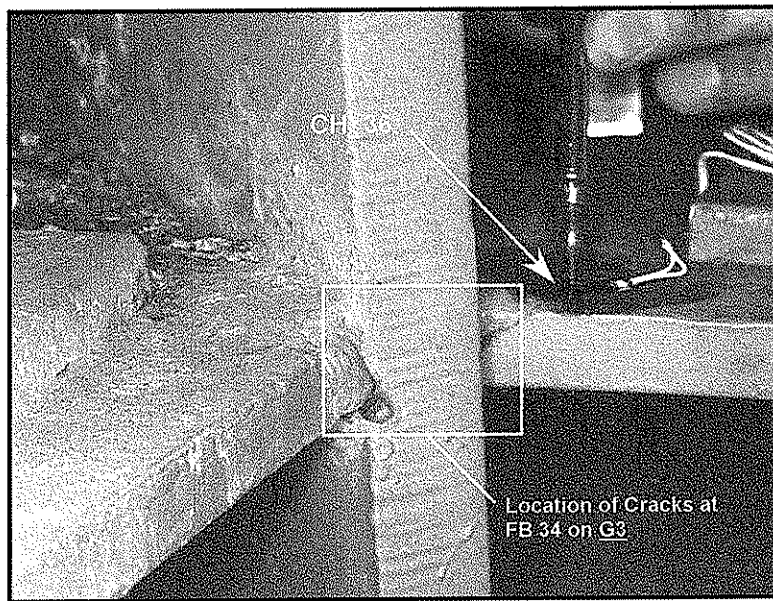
Close-up photograph of gage CH_36 installed at floorbeam FB34 of G3 in bay 2.
